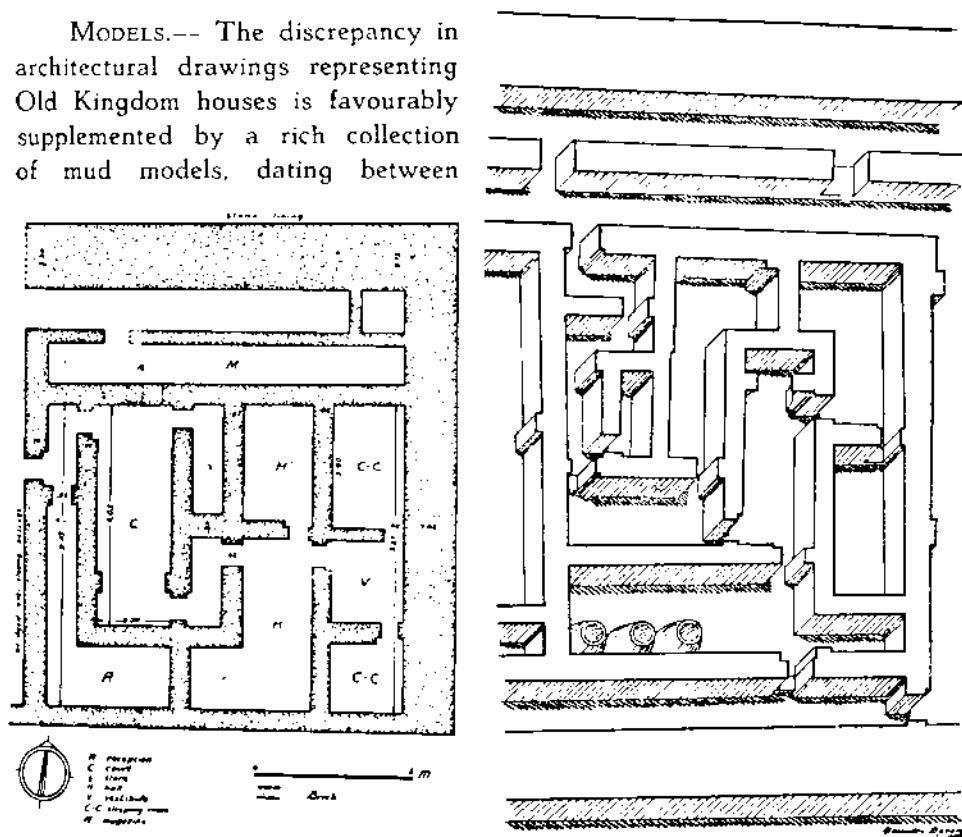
Plan of the last house to the East of the priests' houses and axonometric view of a middle-unit, looking South (Giza).
